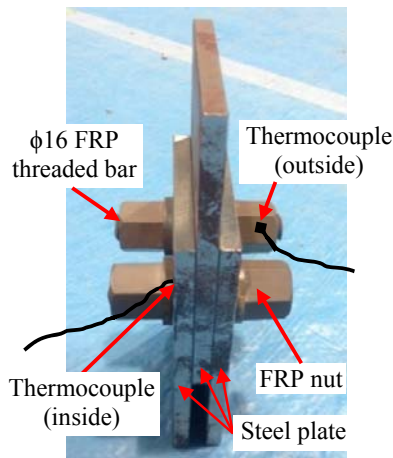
Details of FRP bolt lap-shear test specimen
